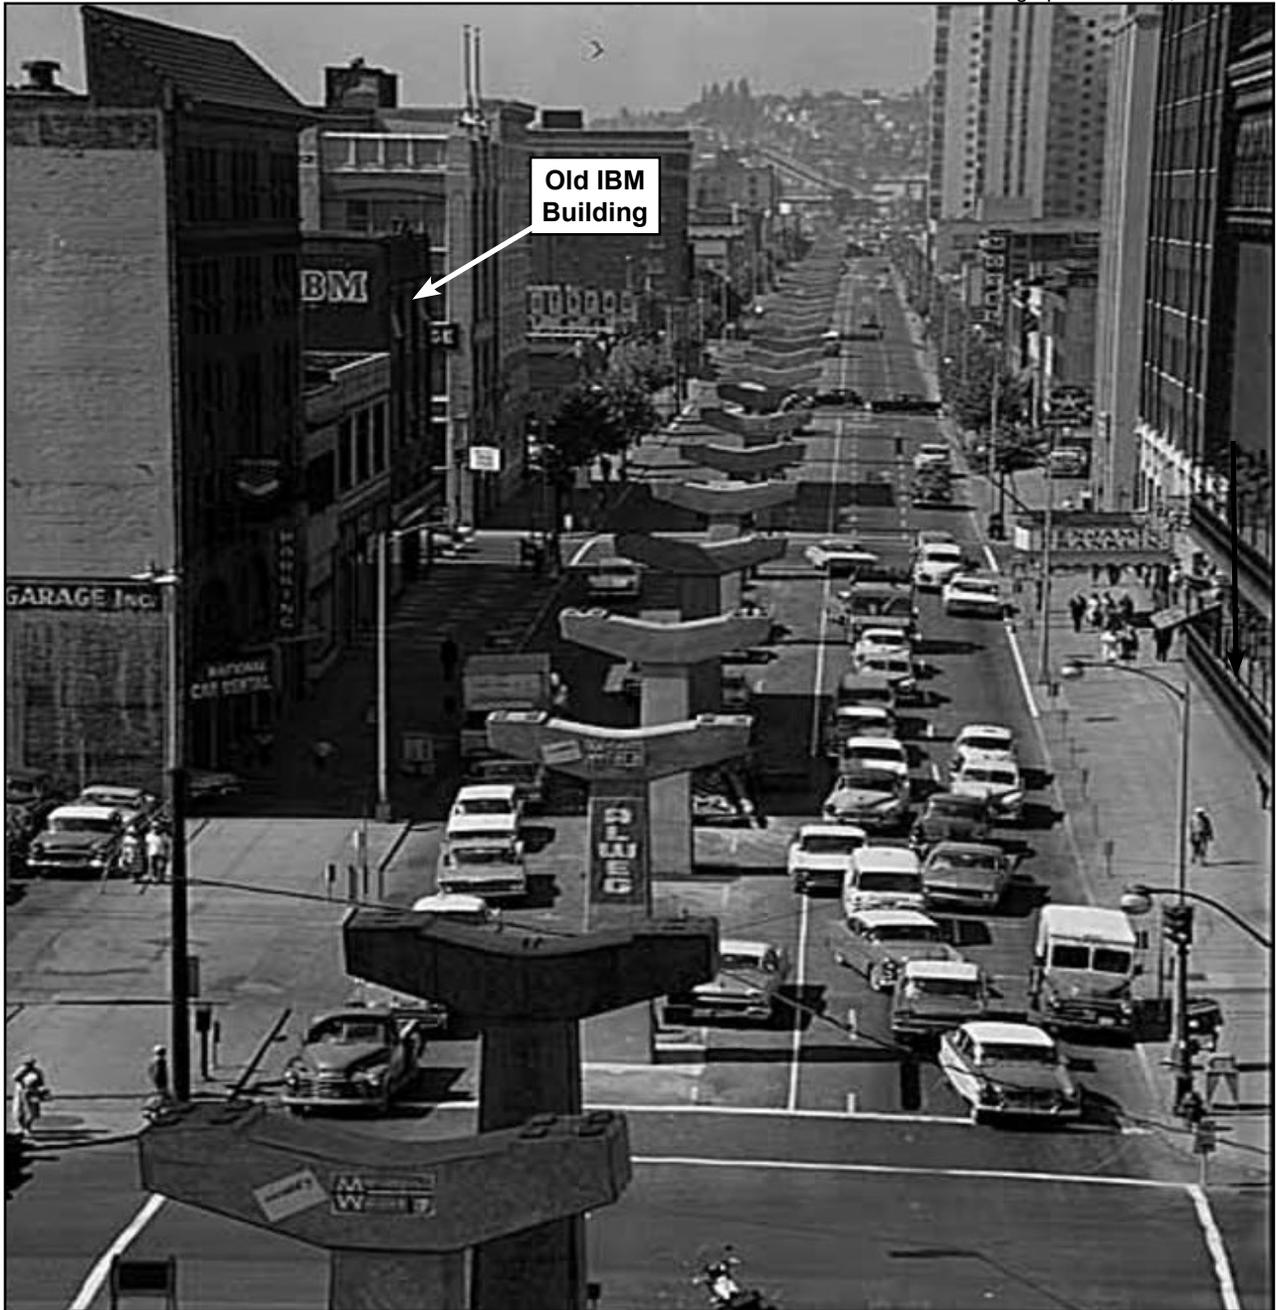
• Monorail Construction, Fifth Avenue, 1961
